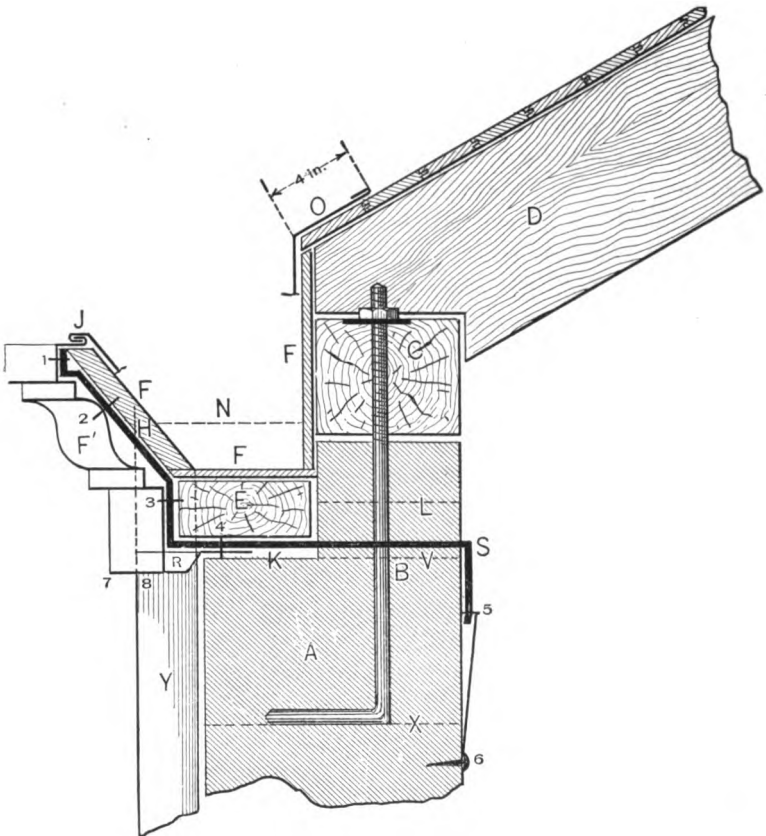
Fastening a Sheet Metal Molding to Brick Wall.
